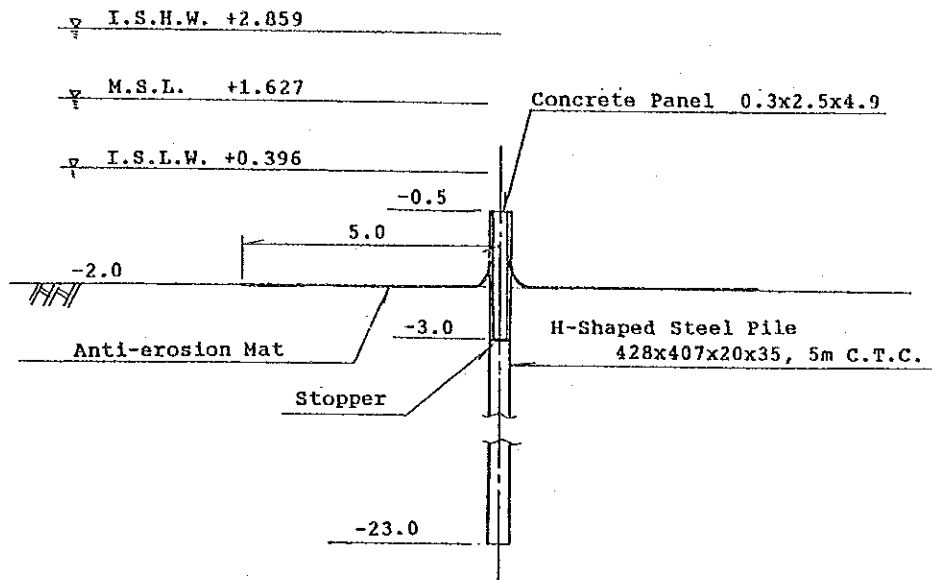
Standard Cross Section of Submerged Walls
